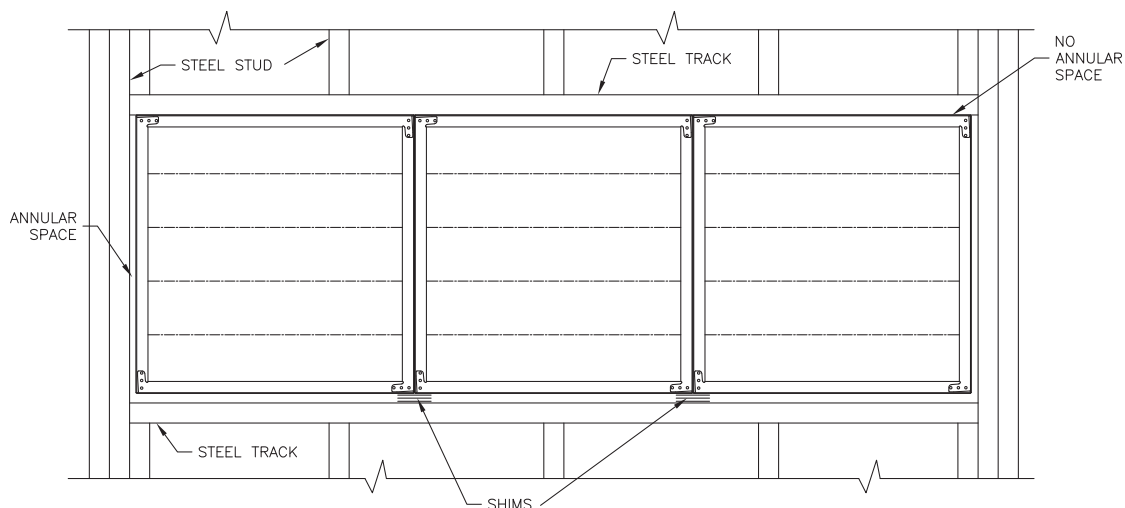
Steel shims left in place where center frame members meet on multiple section wide dampers when the retaining angle is omitted from the top of the damper sleeve.
